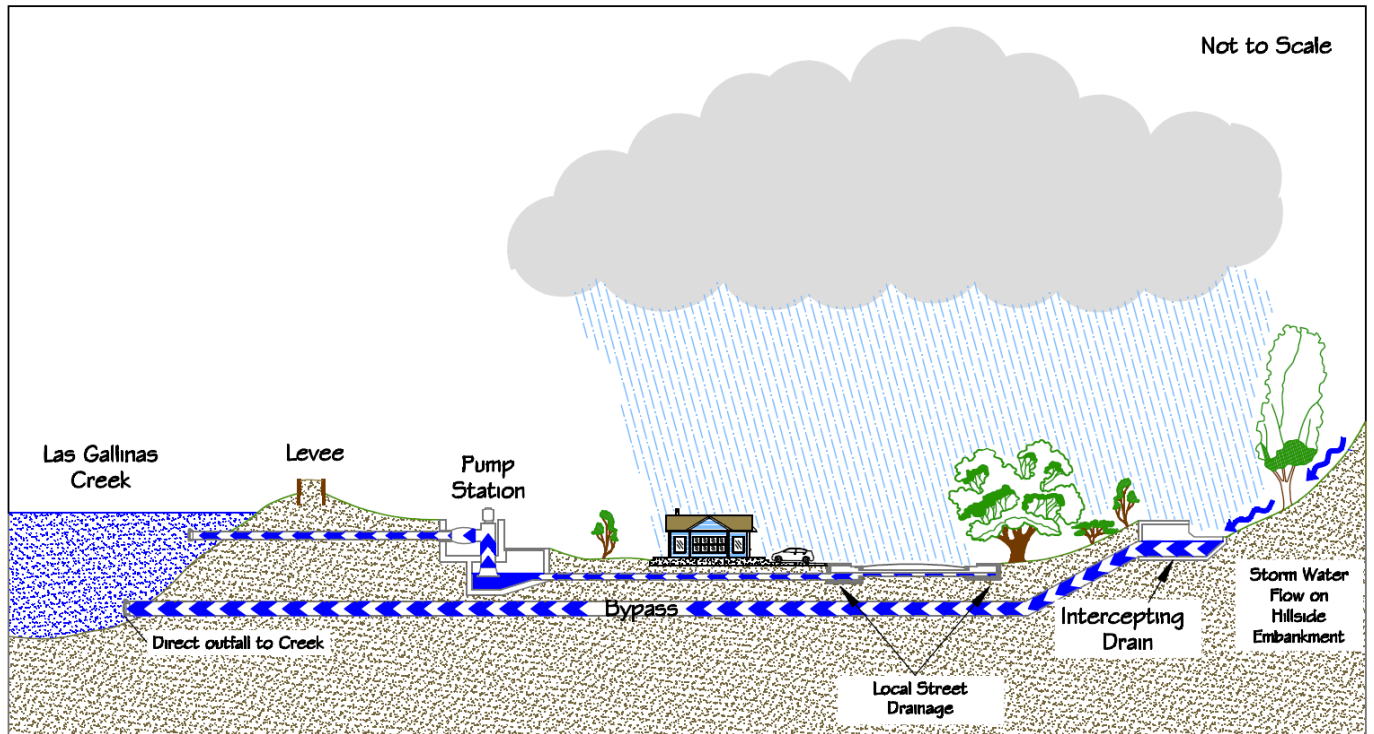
Major stormwater drainage facilities in Santa Venetia.
